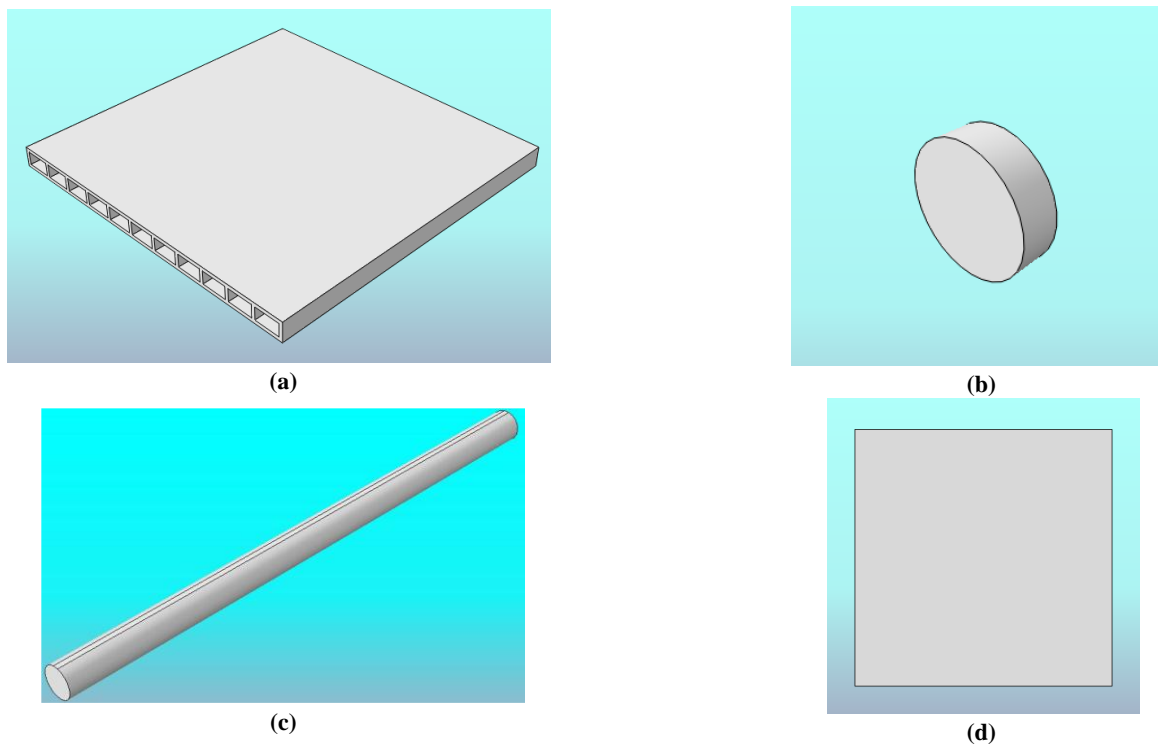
Developed segments: (a) WPC drawing, (b) Drawing of steel part (for point loading), (c) Drawing of a steel part (for linear loading), and (d) Drawing of GFRP sheets.
